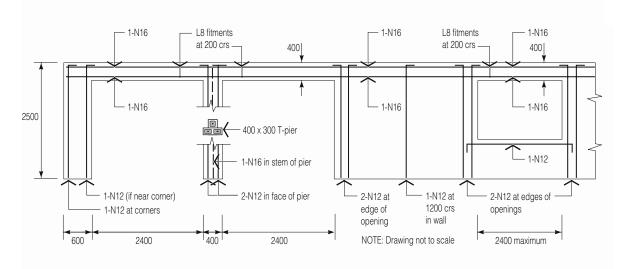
Wall Reinforcement for 140-mm Leaf for Wind Classifications N5 and C2 and 2500-mm Wall Height
